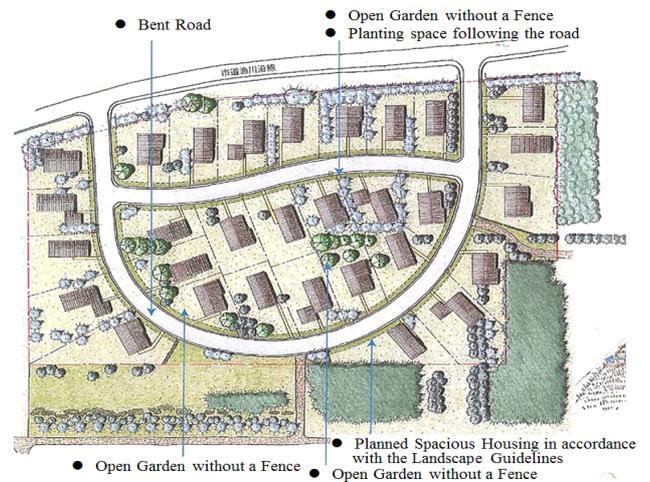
Landscape Guidelines of Breast Garden Eniwa (Source : Blessed Garden ENIWA Homepage, Japan)
